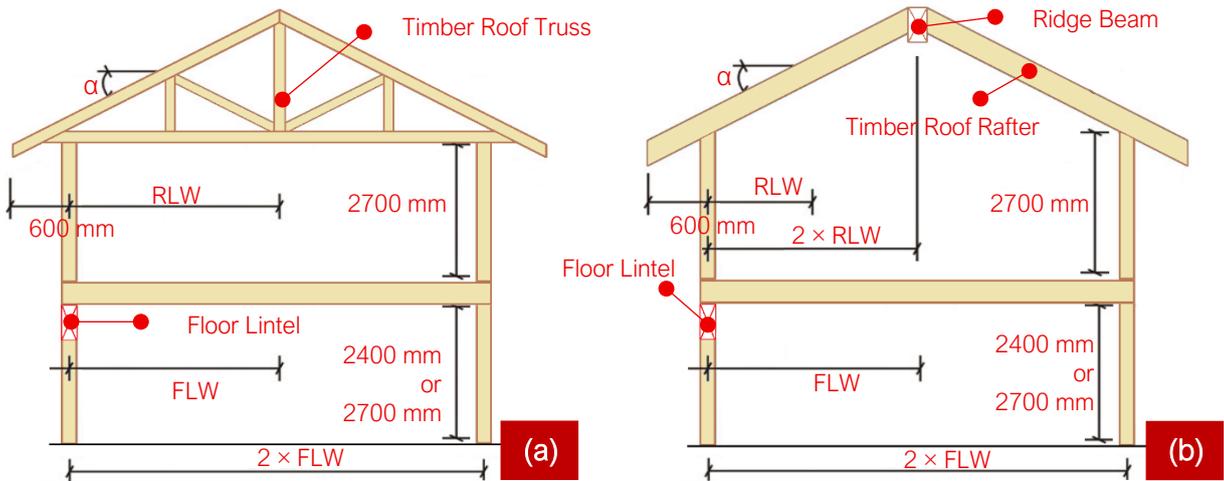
Red Stag Vertix₂₀ floor lintel beam; a) Timber roof truss, b) Timber roof rafter.
